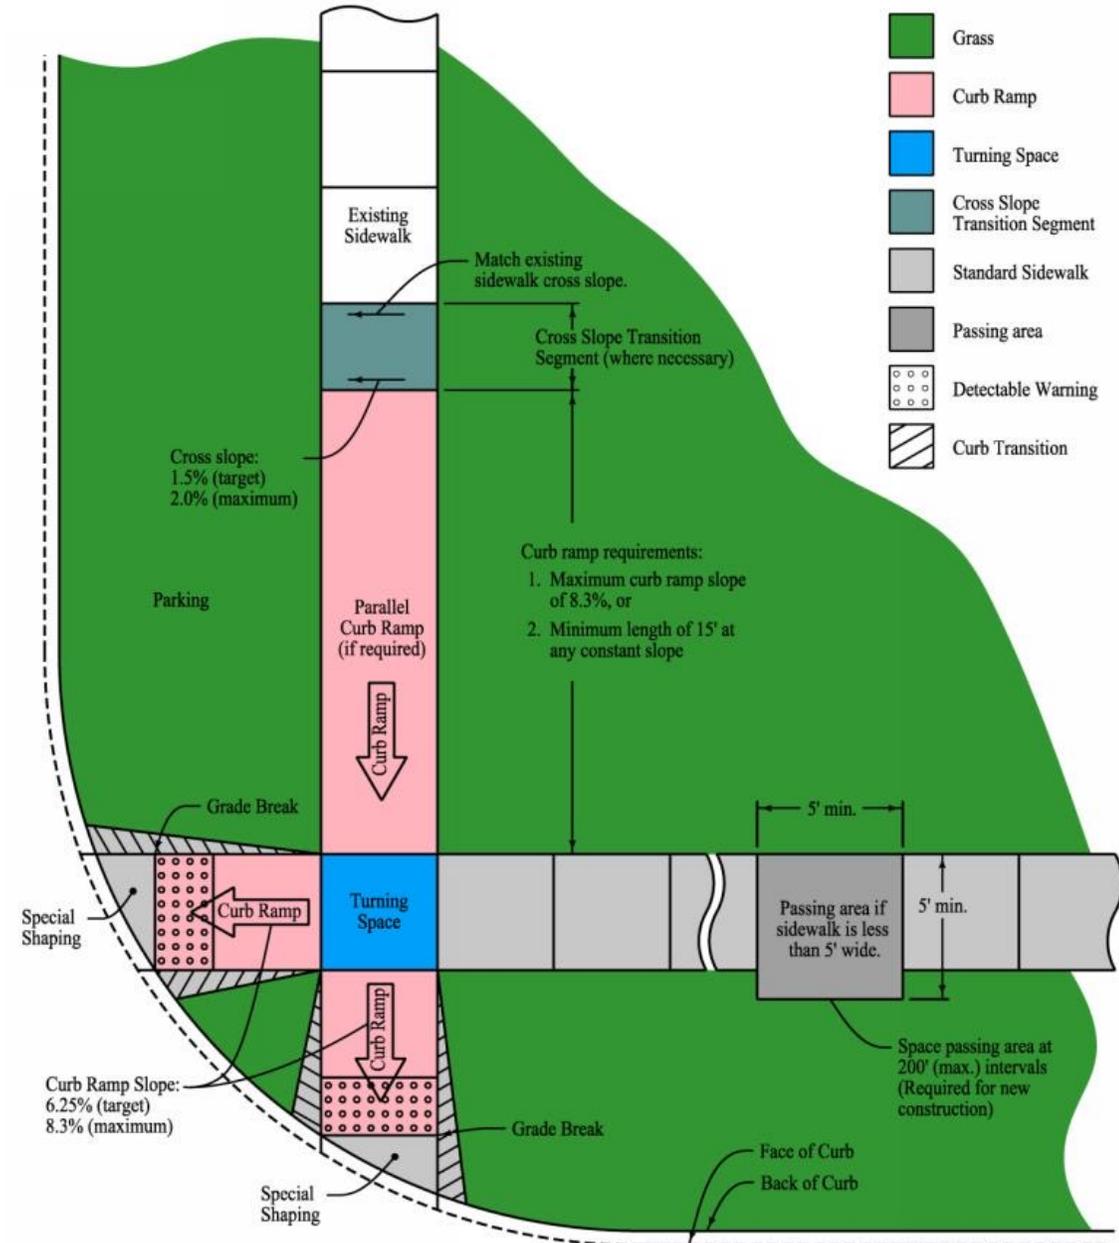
A-2.03: Standard Sidewalk and Curb Ramp Elements
